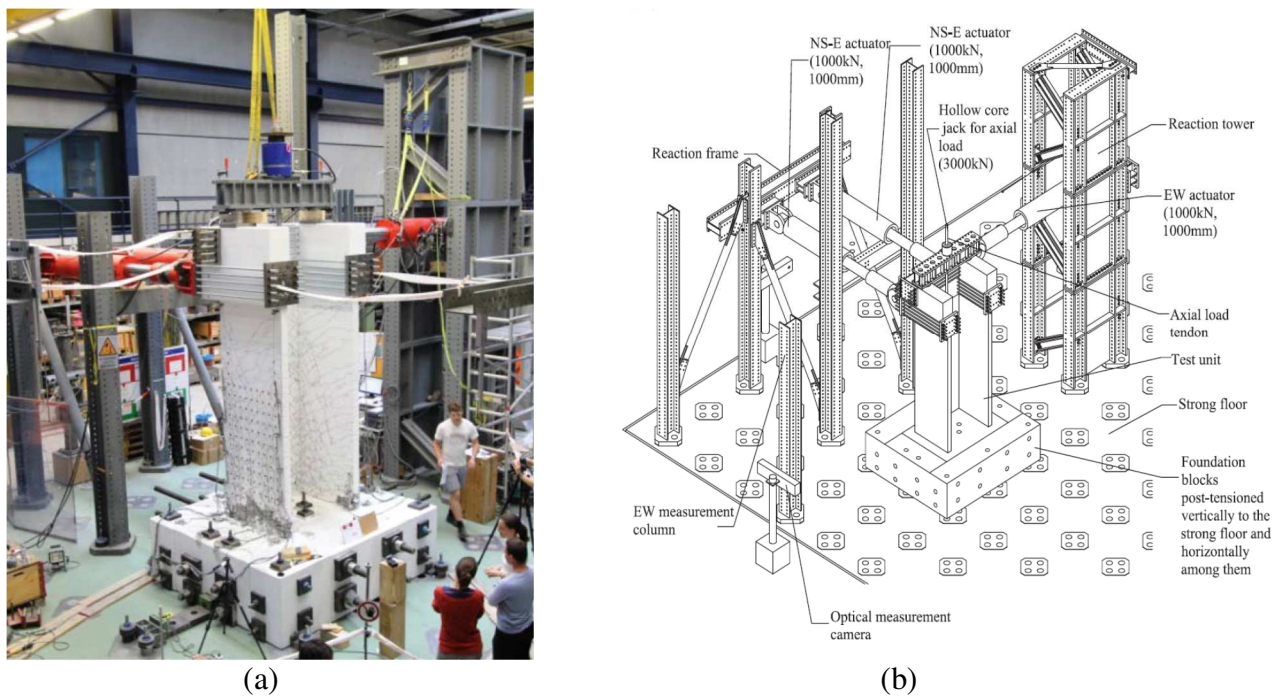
Experimental tests on C-shaped RC walls (Beyer et al., 2008)
